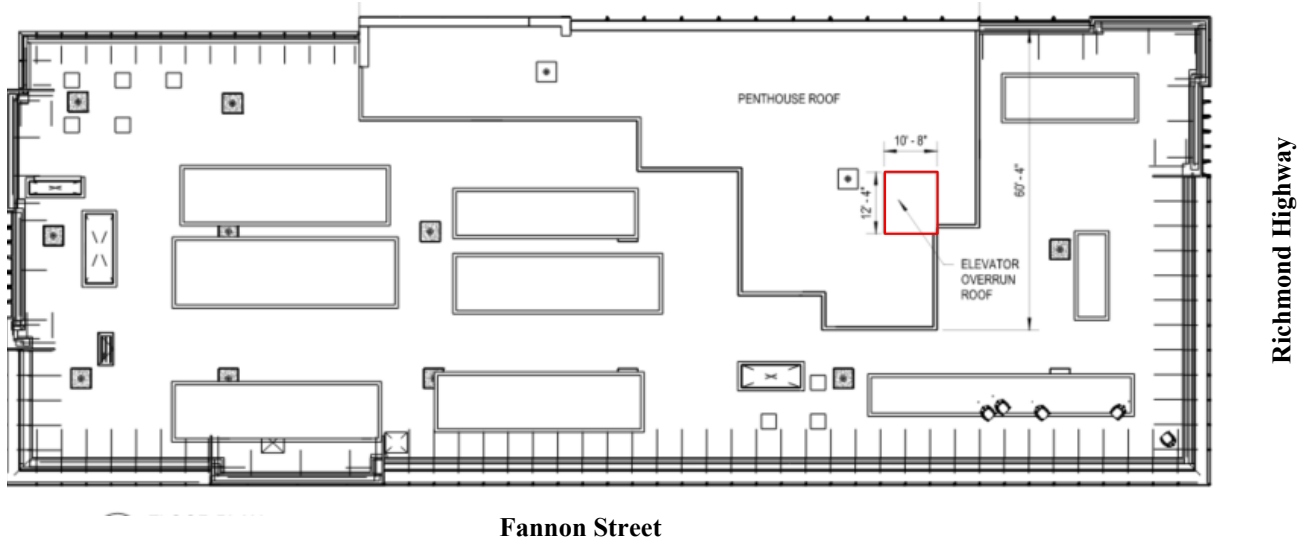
Roof plan showing the proposed location of the elevator overrun, requiring the increased height, outlined in red.
